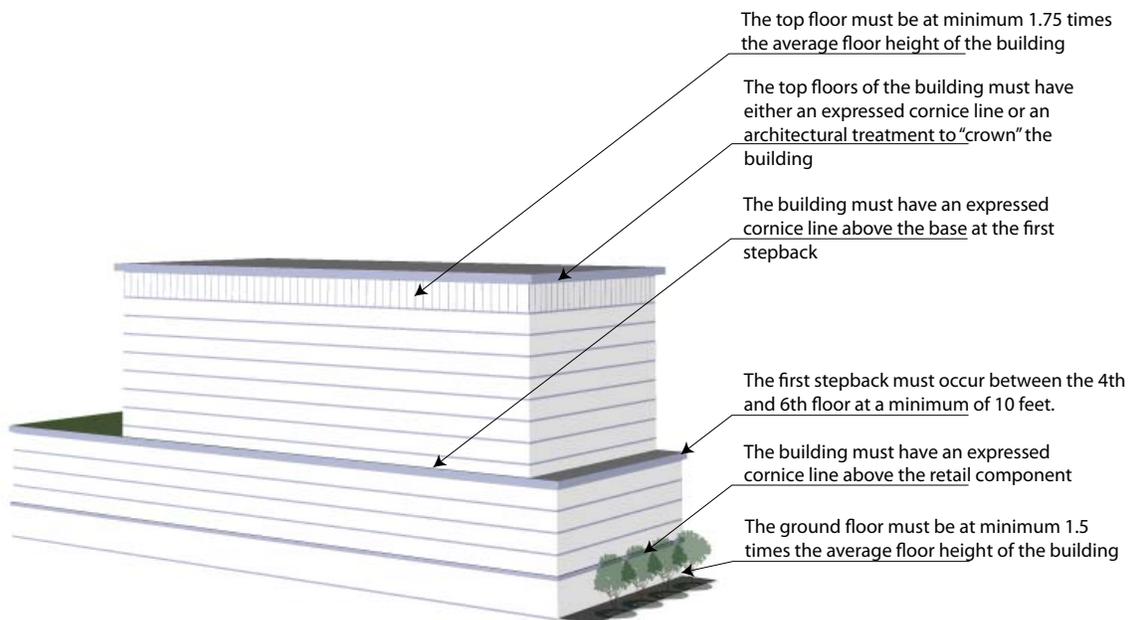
SMALL BUILDING DIAGRAM
